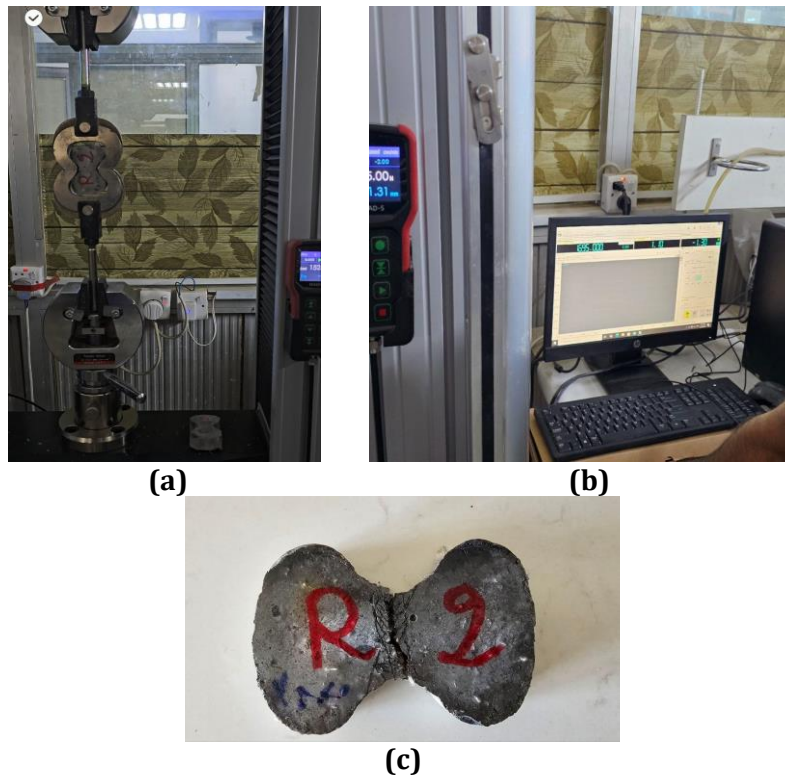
Dog-bone specimens of SCC-ECC mixtures under direct tensile test: (a) specimen mounted in the testing machine during loading, (b) monitoring of stress–strain data acquisition, and (c) specimen after failure showing the final dominant crack and residual fine cracks within the gauge length.
